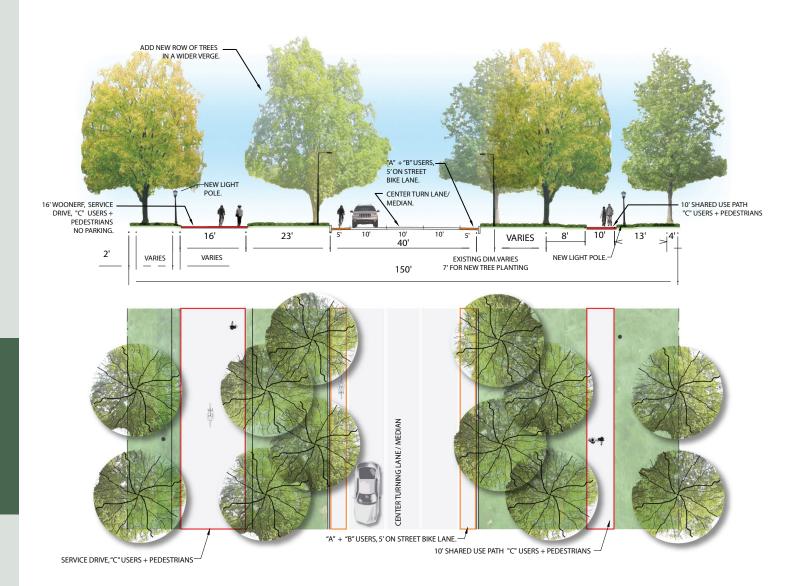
Southern Parkway: Zone 1, 4 & 5 Prototypical Section & Plan
